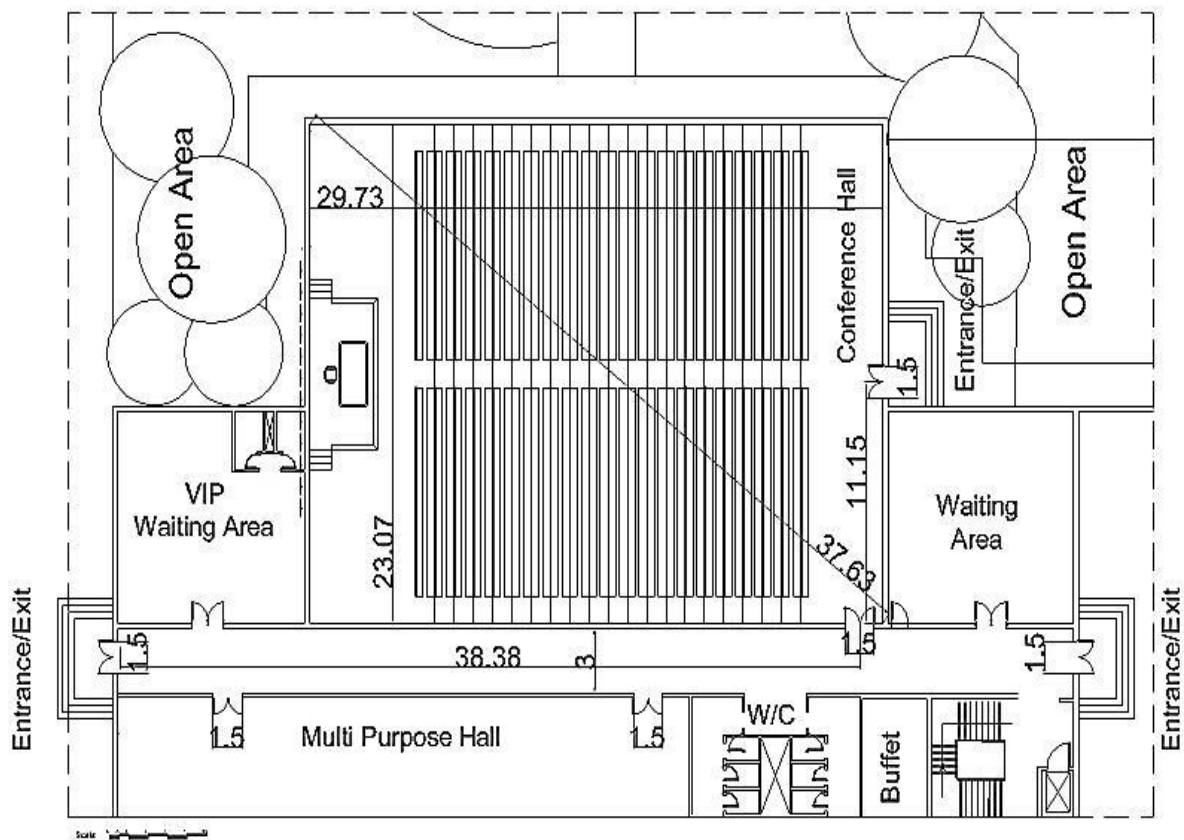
Conference hall ground floor plan "Part of architectural student's graduation project", 2014, Author.
